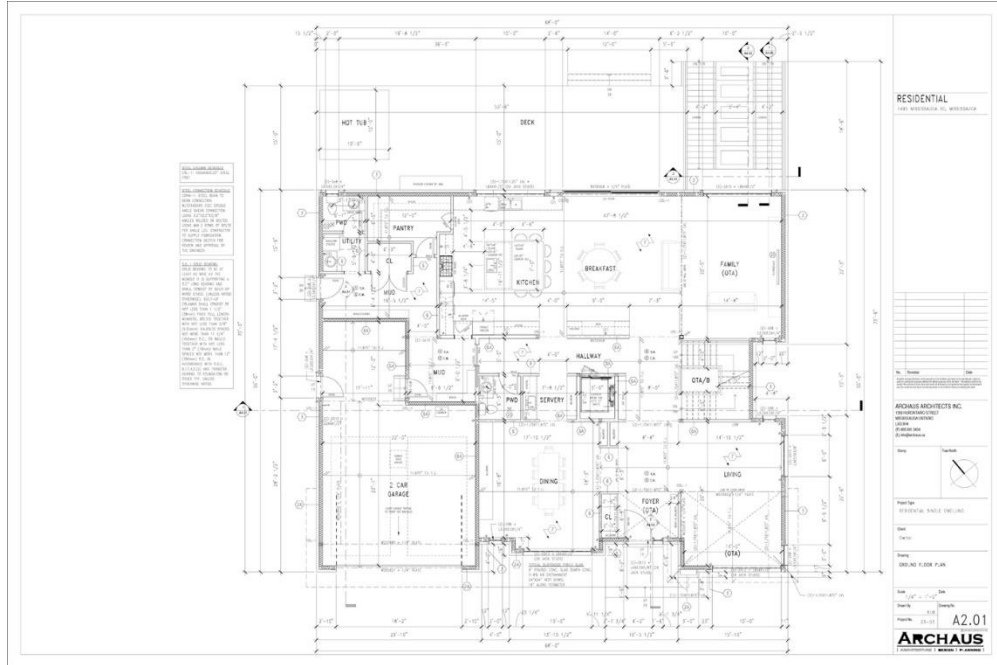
Ground Floor Plan, Archaus, (APPENDIX III)
